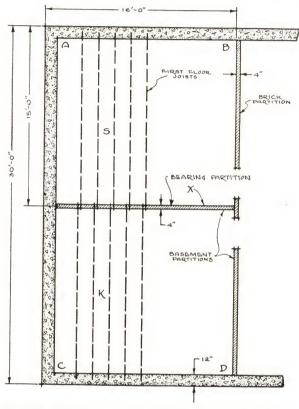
Part of a Basement Plan Showing How Bearing Partition Supports First-Floor Joists
